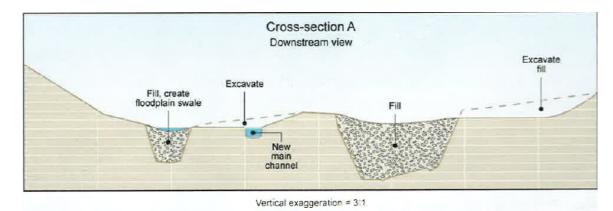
Conceptual plan for the general design of the Area A restoration. A new main channel much smaller than the existing channel was constructed. Floodplain was graded adjacent to the new channel. Excess material was used to fill existing channels.
